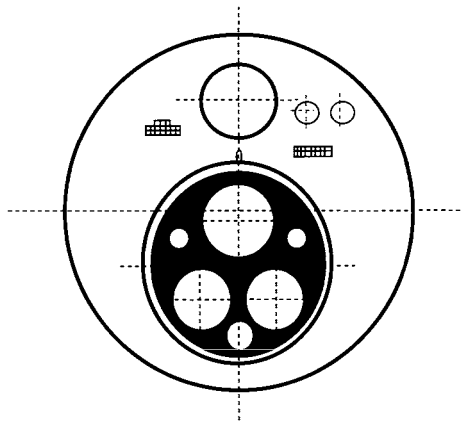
Statoil Gullfaks Bundle Cross-Section. Various materials are welded side-by-side — complicating the welding operations. Three product lines are held together within an insulated sleeve and with three small diameter hot water and glycol lines to provide a heat-up system to melt hydrates in the event of a shut down (see also Table 1).
